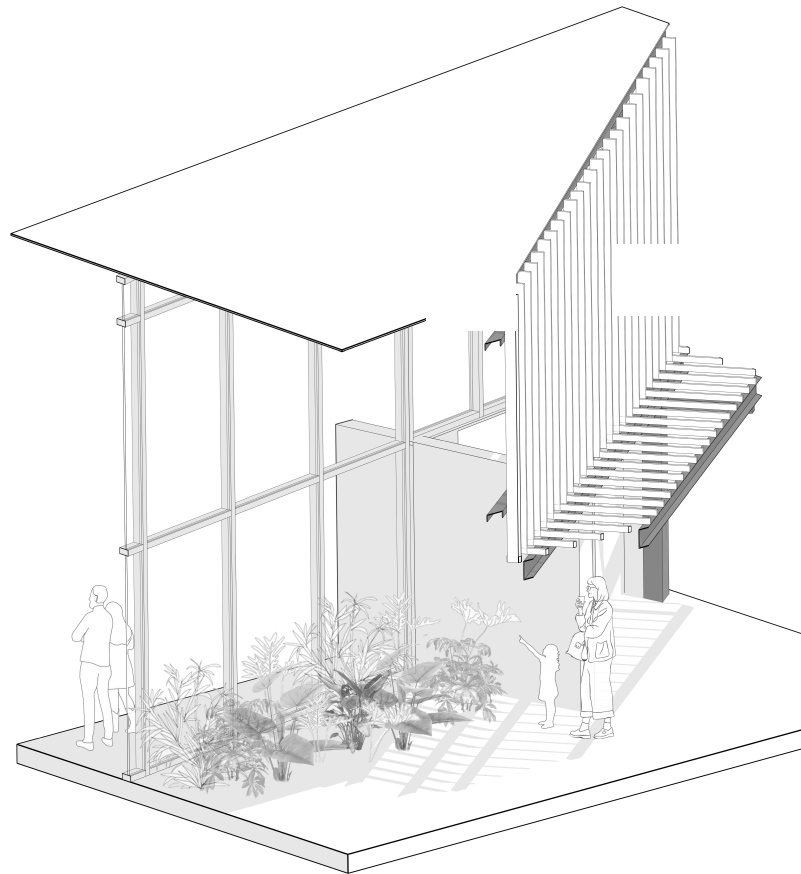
Detail D, Timber pergola and shading: (Author 2021)
